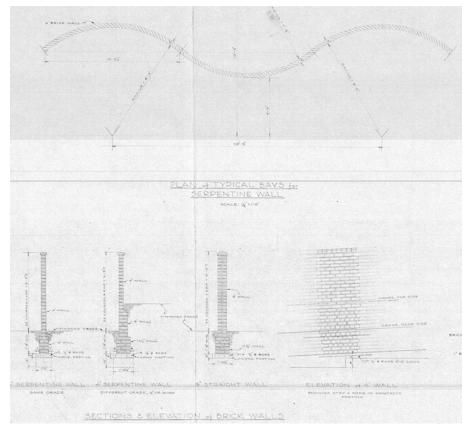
Serpentine wall details showing serpentine alignment and arcs above, and the details of the one-brick width, cap, footings, and common bond coursing aligned to parallel the grade below. (R-JAV-FMRC-FF-1950-03-33824_1W-M-3-Pav1WallDetails.jpg)
